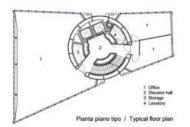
Floorplan of the Shizuoka Press and Broadcast centre (Archweb, n.d.)
